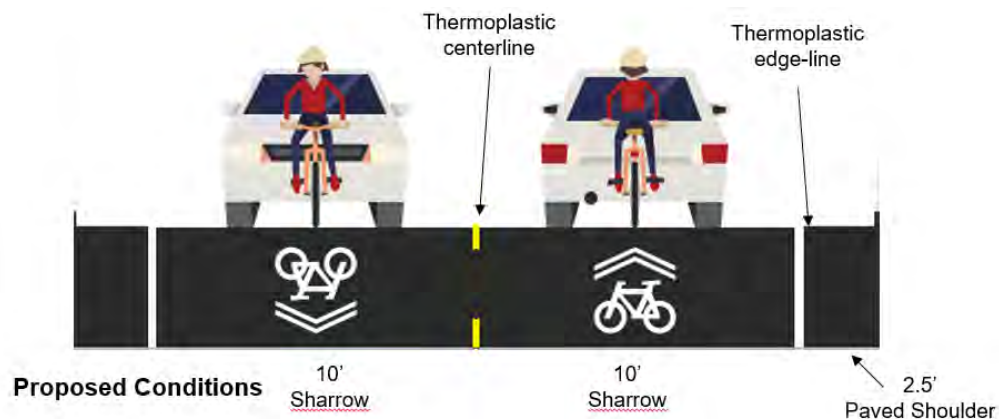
Proposed Cross Section at View Avenue and Ocean Avenue
